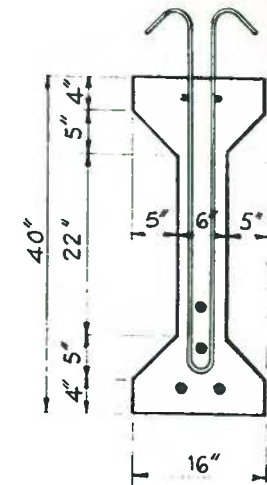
Revised Tampa Bay girder as used in subsequent structures.
